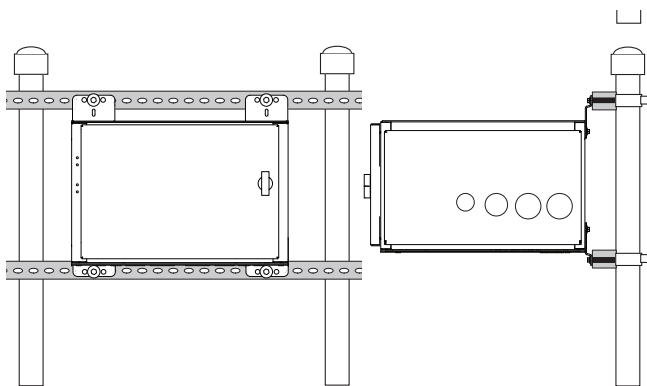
, FBE2322-AEE H-Frame Mounting Example.
